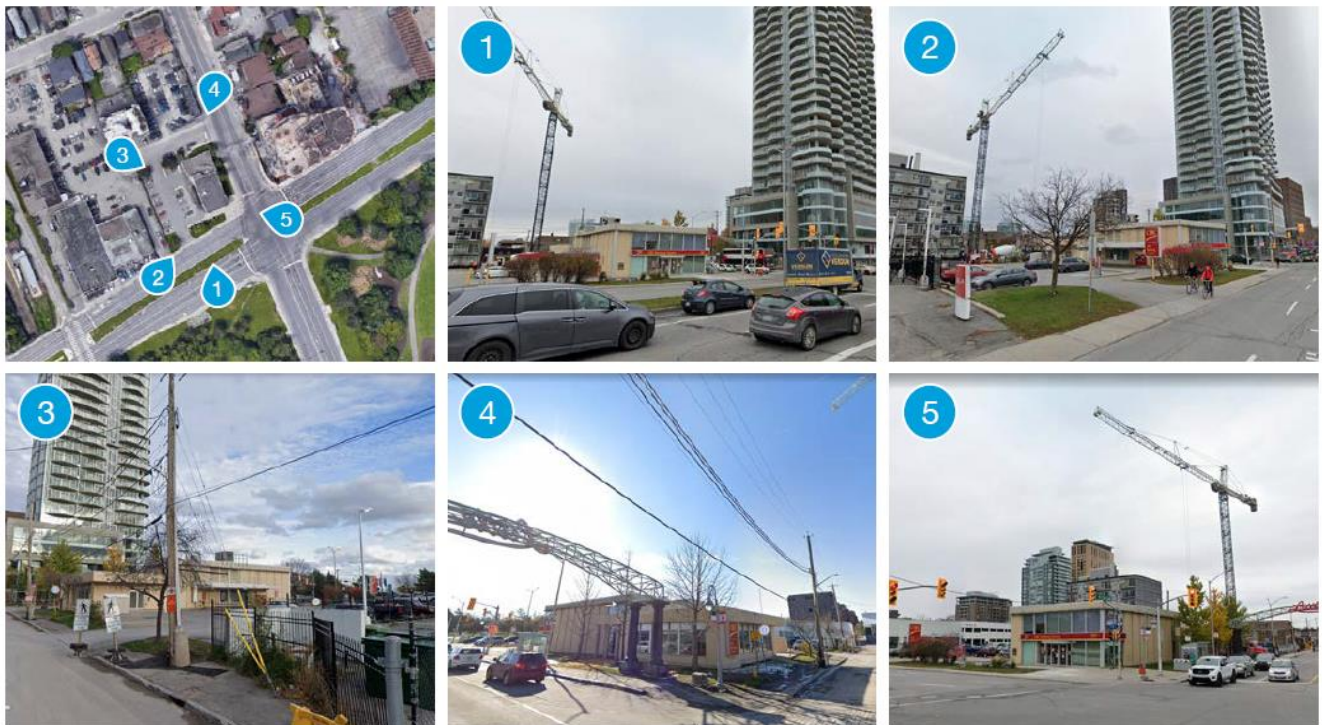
Site Photos—View of Subject Site from Surrounding Area
